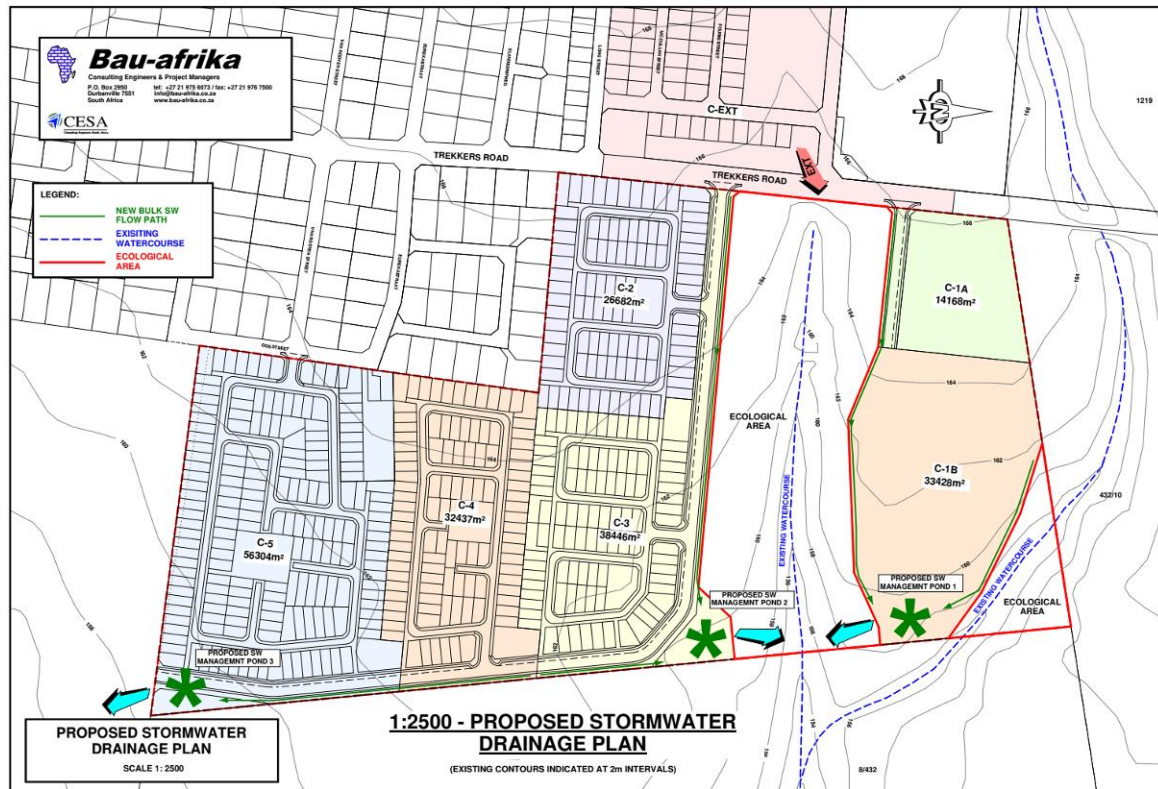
Proposed Post-Development Drainage Plan (Source: Bau-Afrika 2019)
